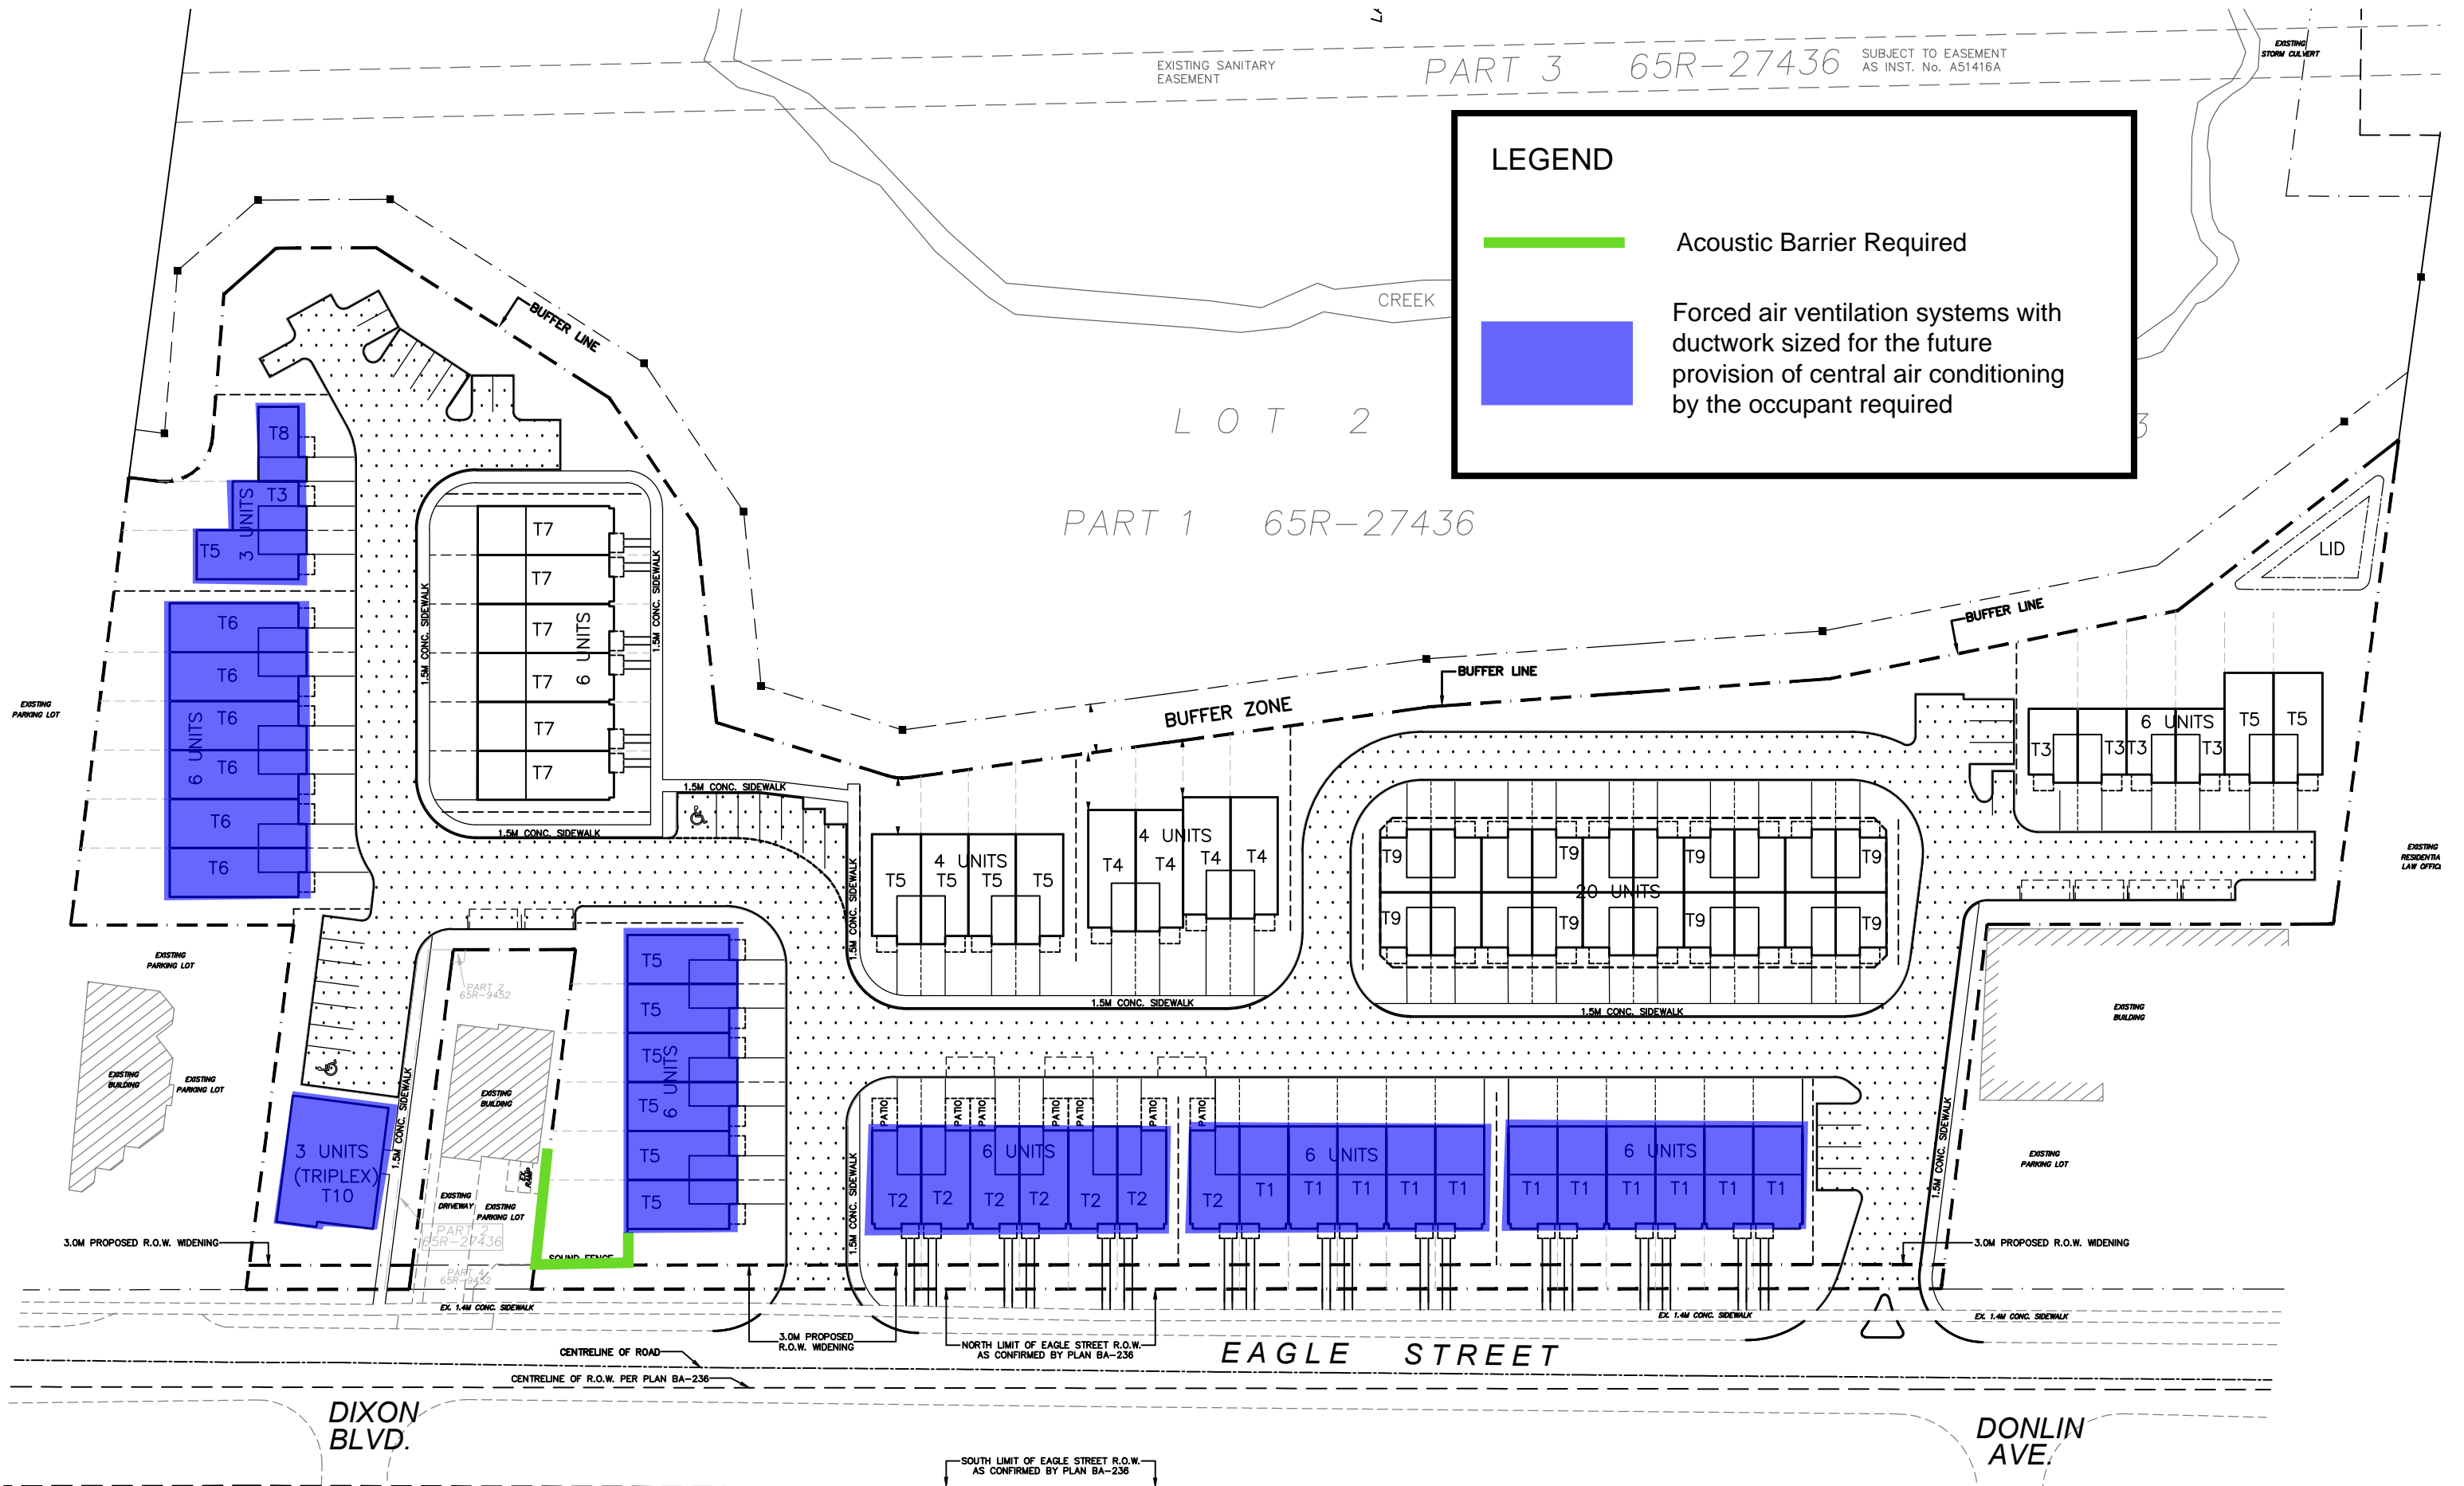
Draft Site Plan Showing Barrier and Ventilation Requirements
